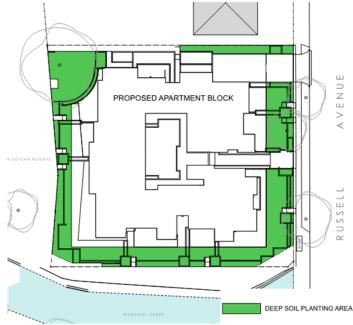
Site plan illustrating quantum and indicative location of deep soil zones.
